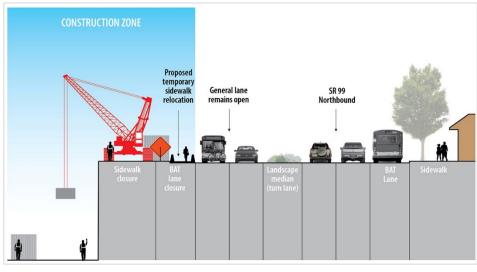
Construction of Trench Guideway on Side of SR 99
